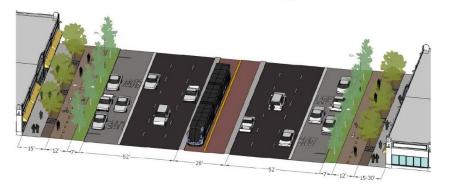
Proposed 200-foot Cross-Section - Between I-696 and 14 Mile Road
